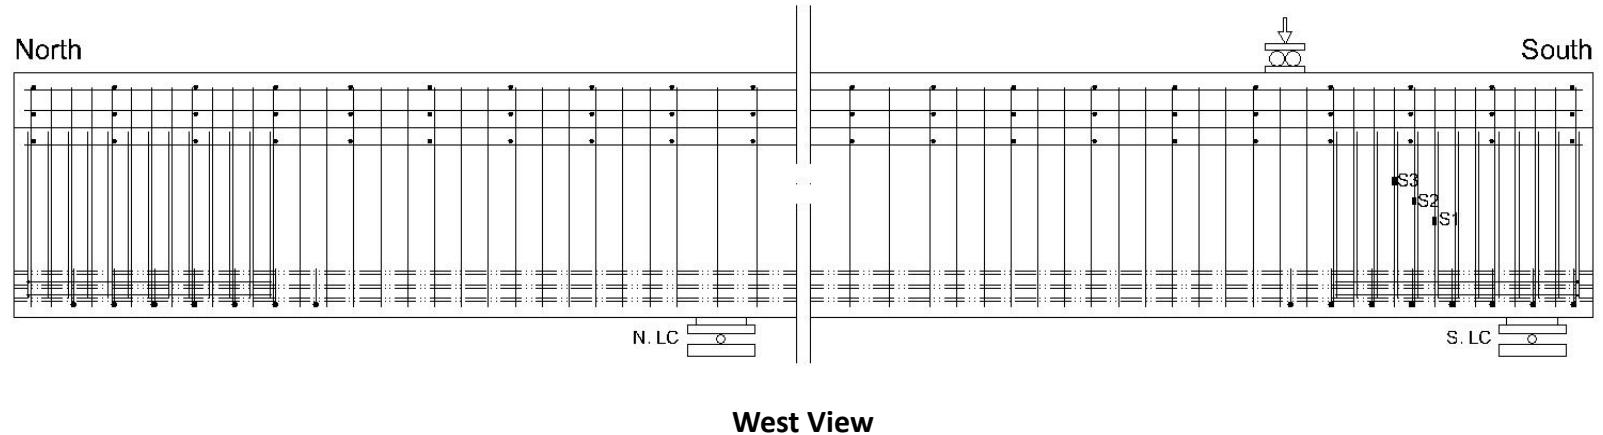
Layout of Strain Gauges on Transverse Reinforcement for Girder G1-South End Testing (Labib 2012)
